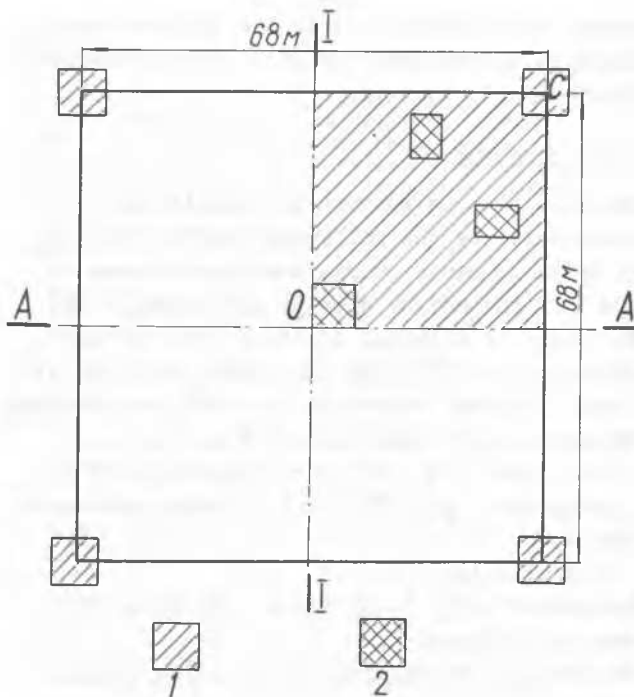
Diagram illustrating the arrangement of the measuring devices in the lower cast-in-situ foundation slab: I - the places of installation of the earth pressure cells; 2 - the places of installation of the reinforcement dynamometers and concrete extensometers
